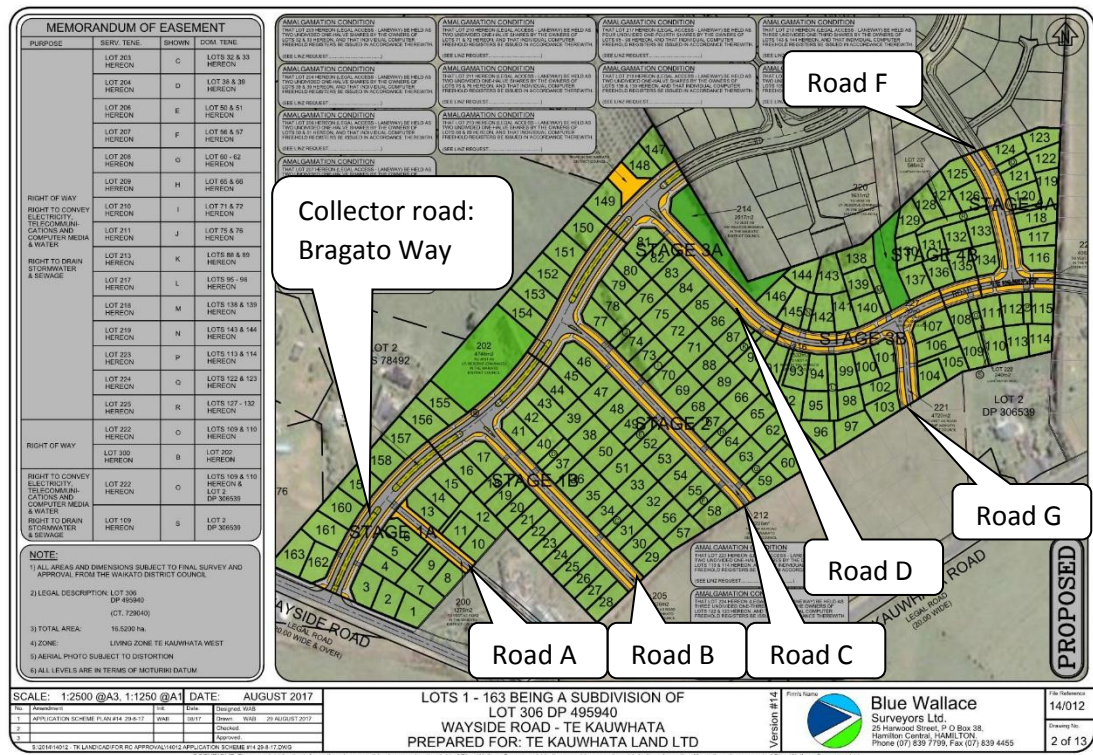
Structure Plan Road Layout Overlaid on Proposal
